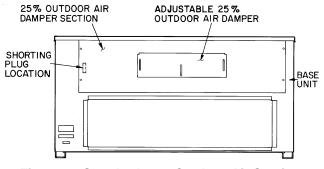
Standard 25% Outdoor-Air Section Details (13 to 25 Ton Units)
